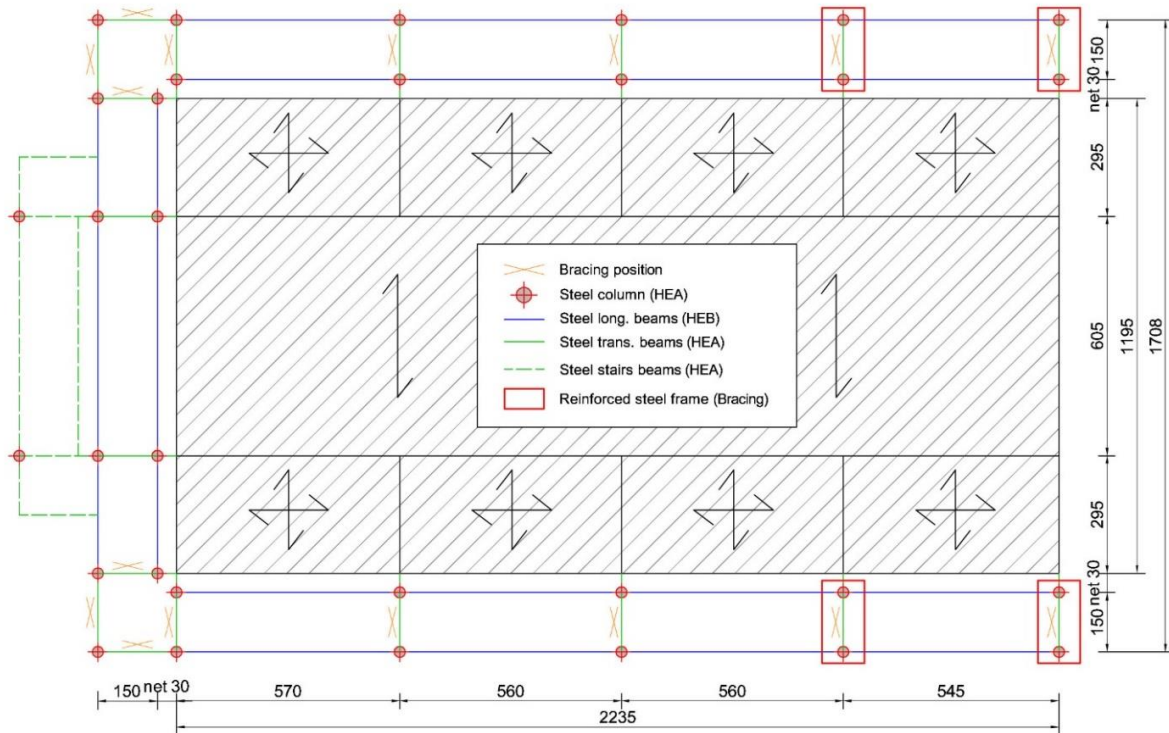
Planimetric scheme of the exoskeleton identifying the profiles used and indicating the positions of the bracing (cm as units)
